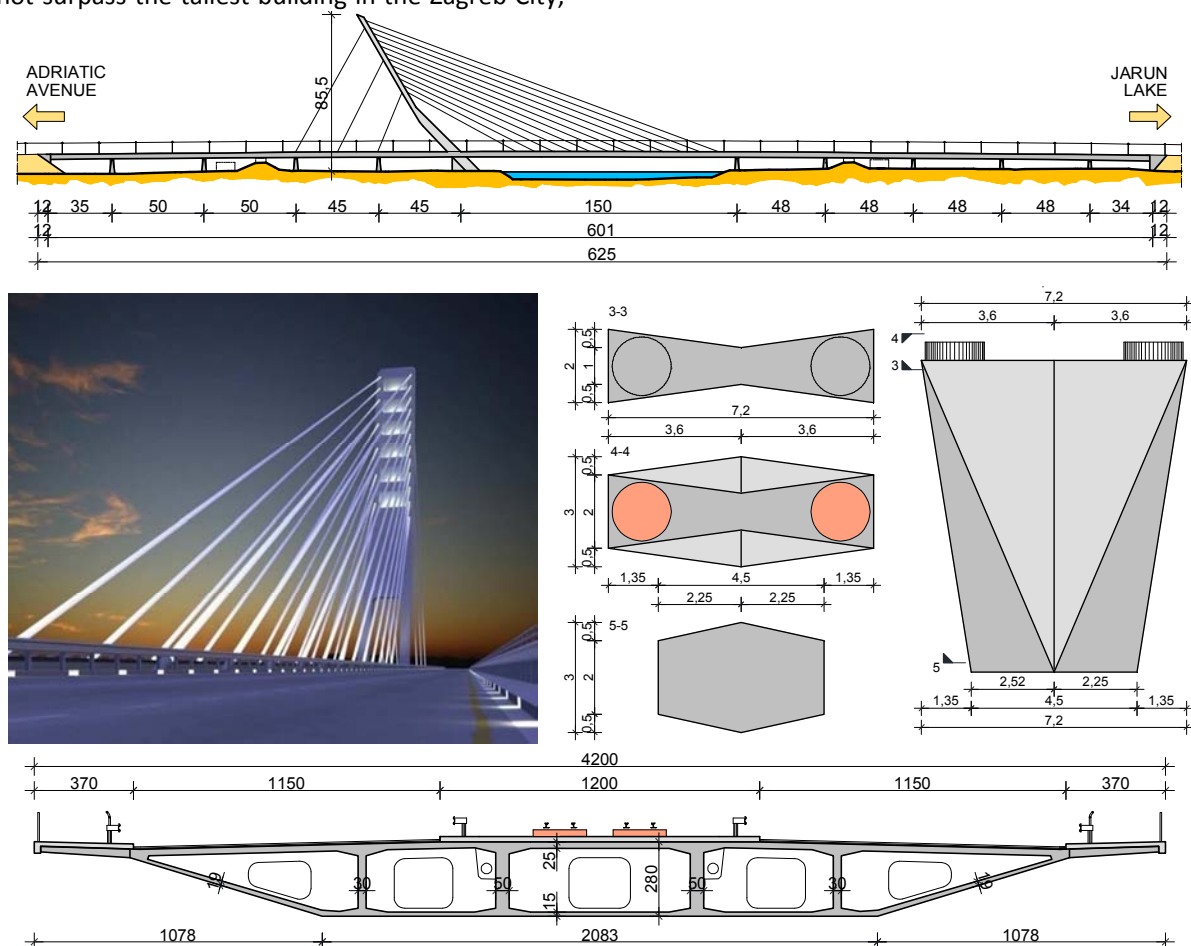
Jarun City Bridge: longitudinal layout, night view, variable size piers and wide cross section
